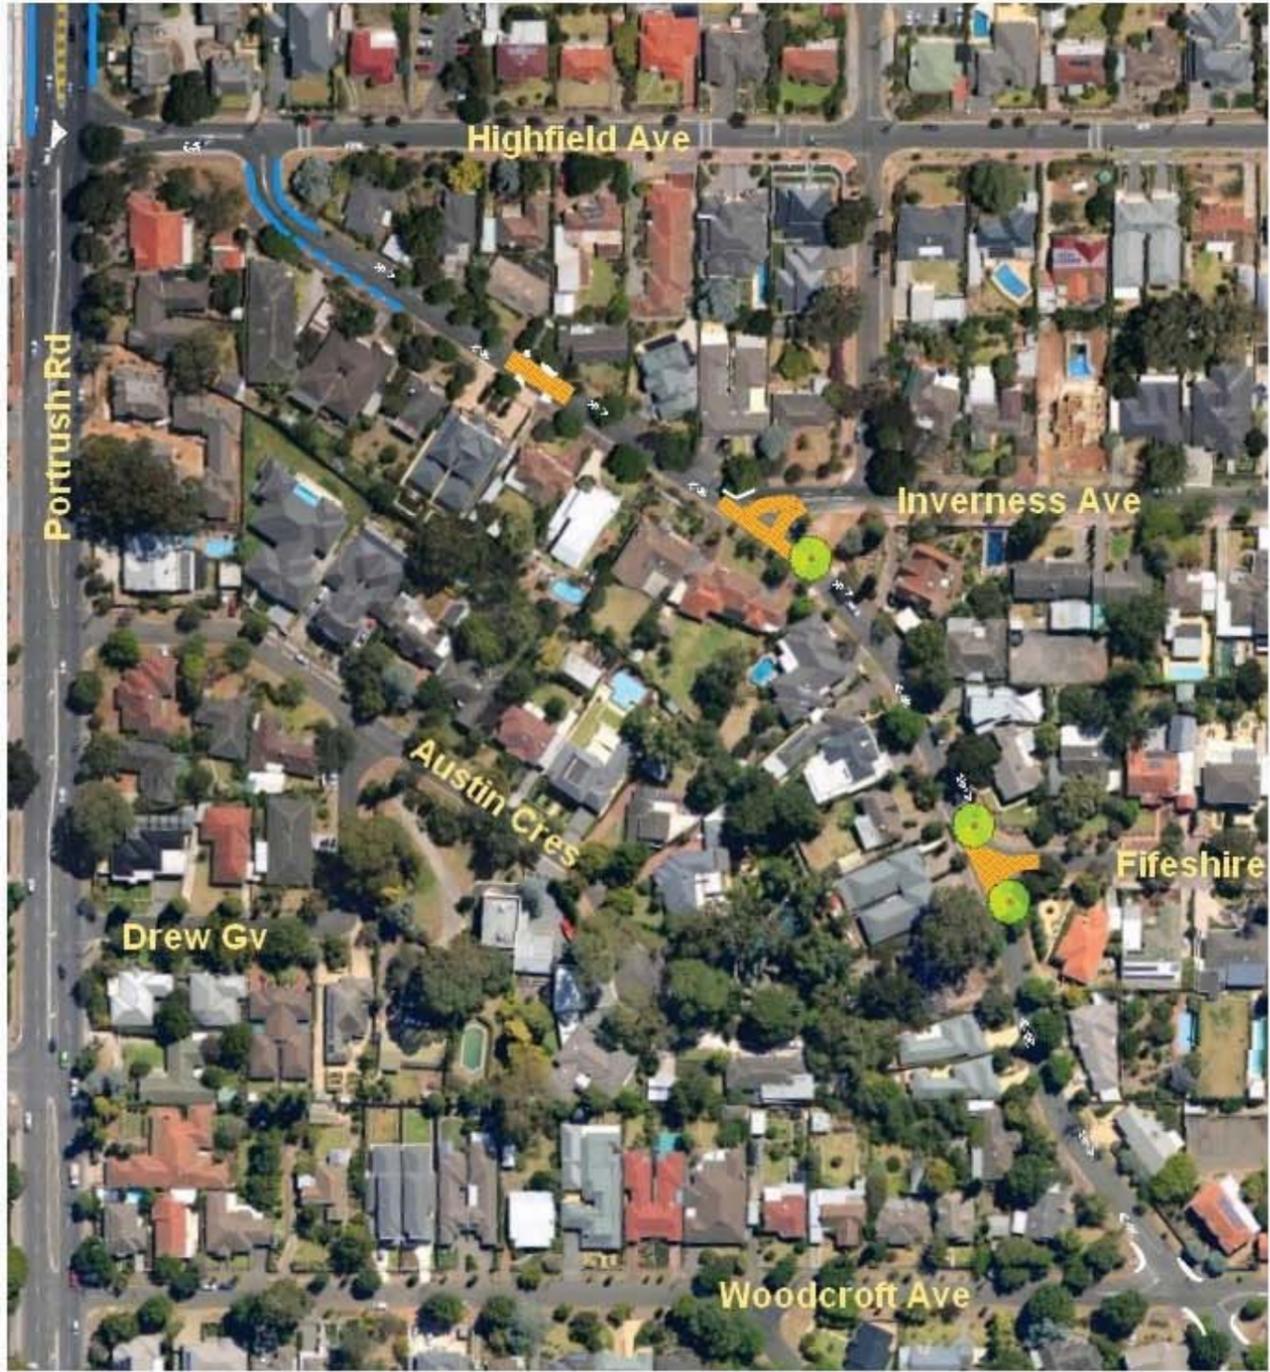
Anglesea Avenue, Highfield Avenue to Sunnyside Road
